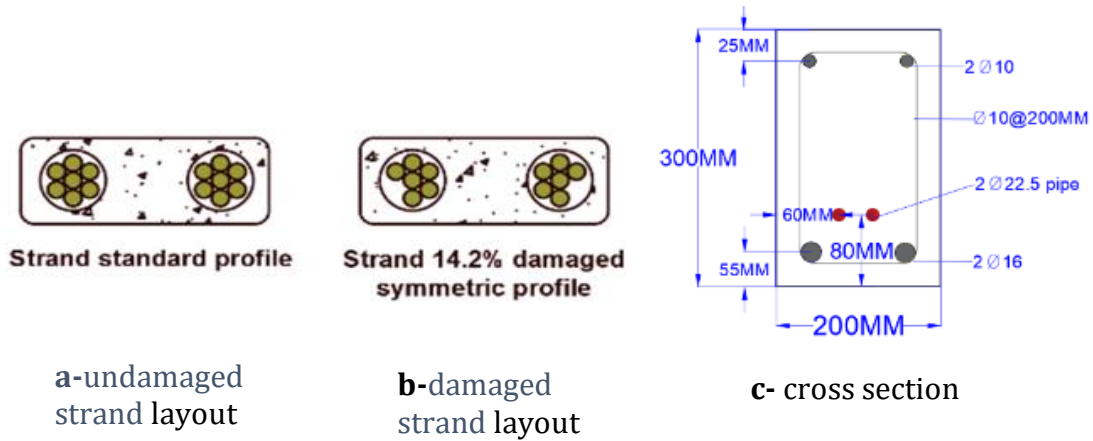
Cross-sectional detail and strand damage a-undamaged strand layout, b-damaged strand layout, c- cross-section
